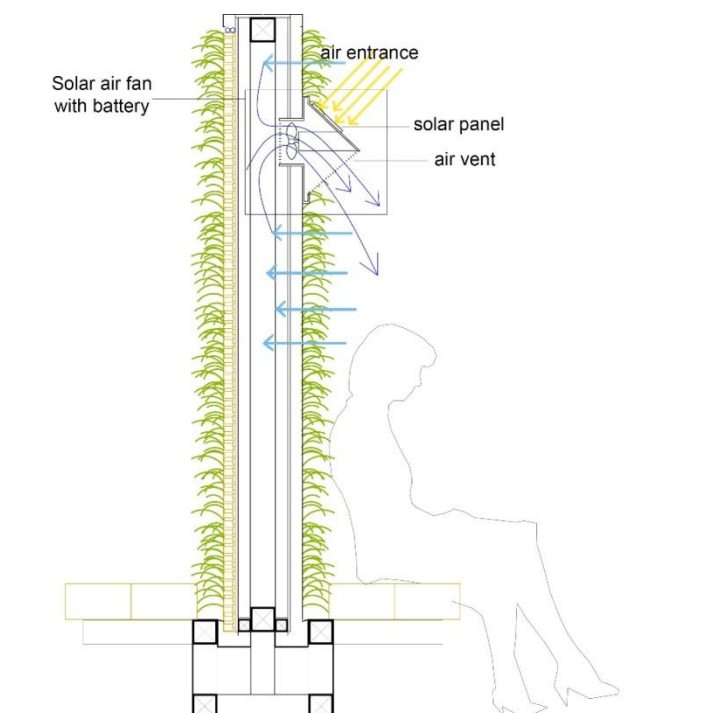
Vegetable board constructive section (Source: SingularGreen).
